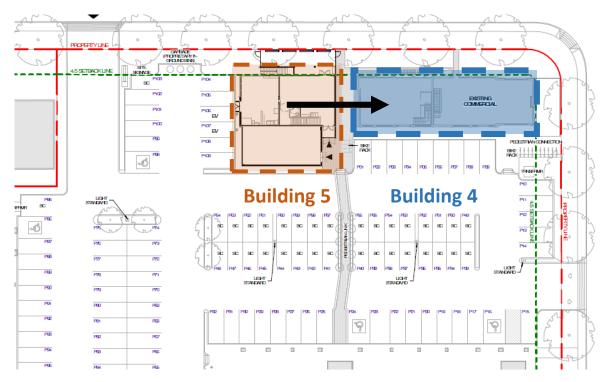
Proposed (Building 5) and Existing (Building 4) Buildings
